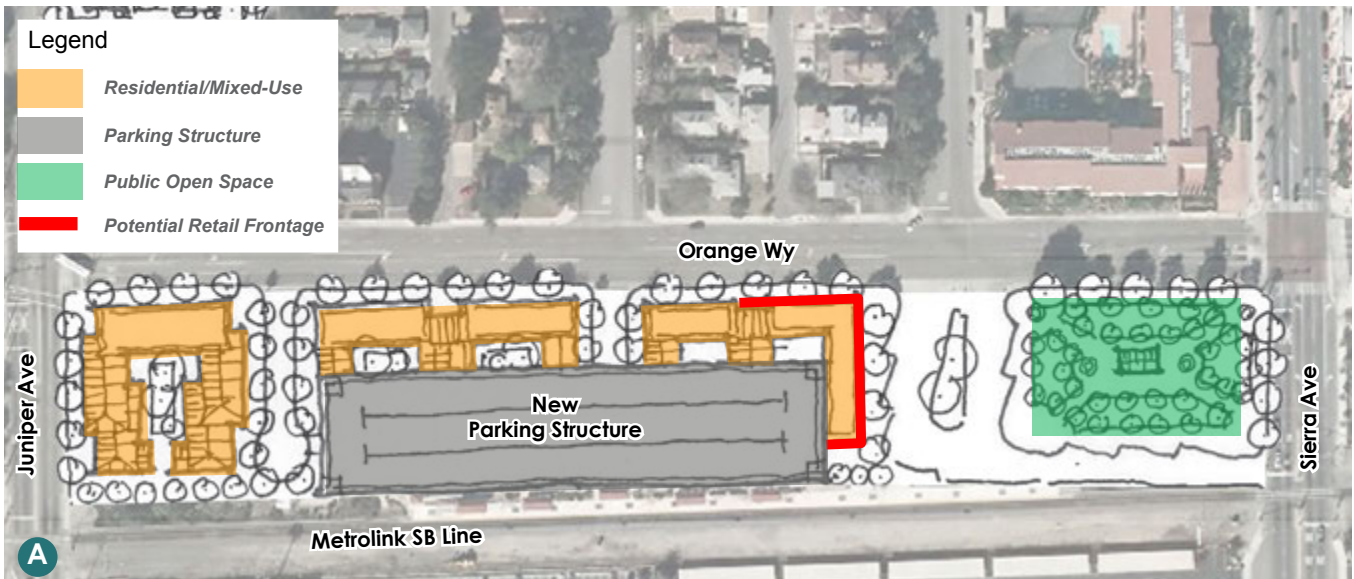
ILLUSTRATIVE SITE PLAN CONCEPT FOR MIXED-USE RESIDENTIAL AT THE METROLINK STATION
